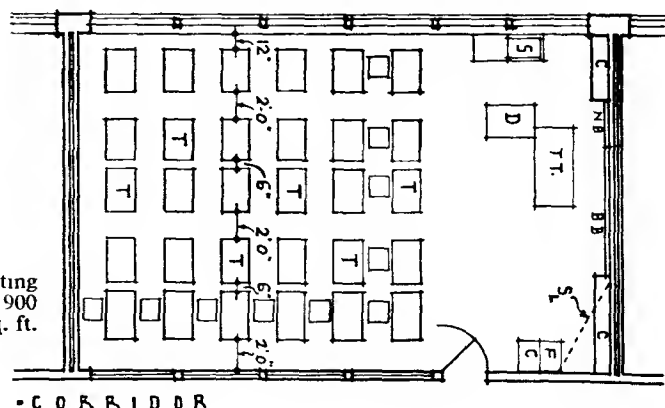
illustrates a typical layout for a typewriting room based on the space requirements for 30 pupils.
